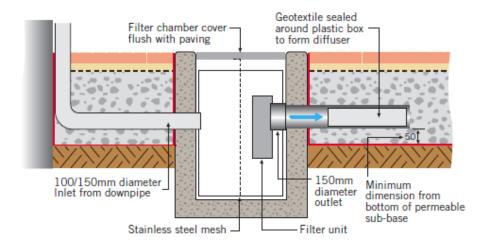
TYPICAL ROOF DRAINAGE OUTLET (INTERPAVE GUIDANCE DOCUMENT, 2008)
